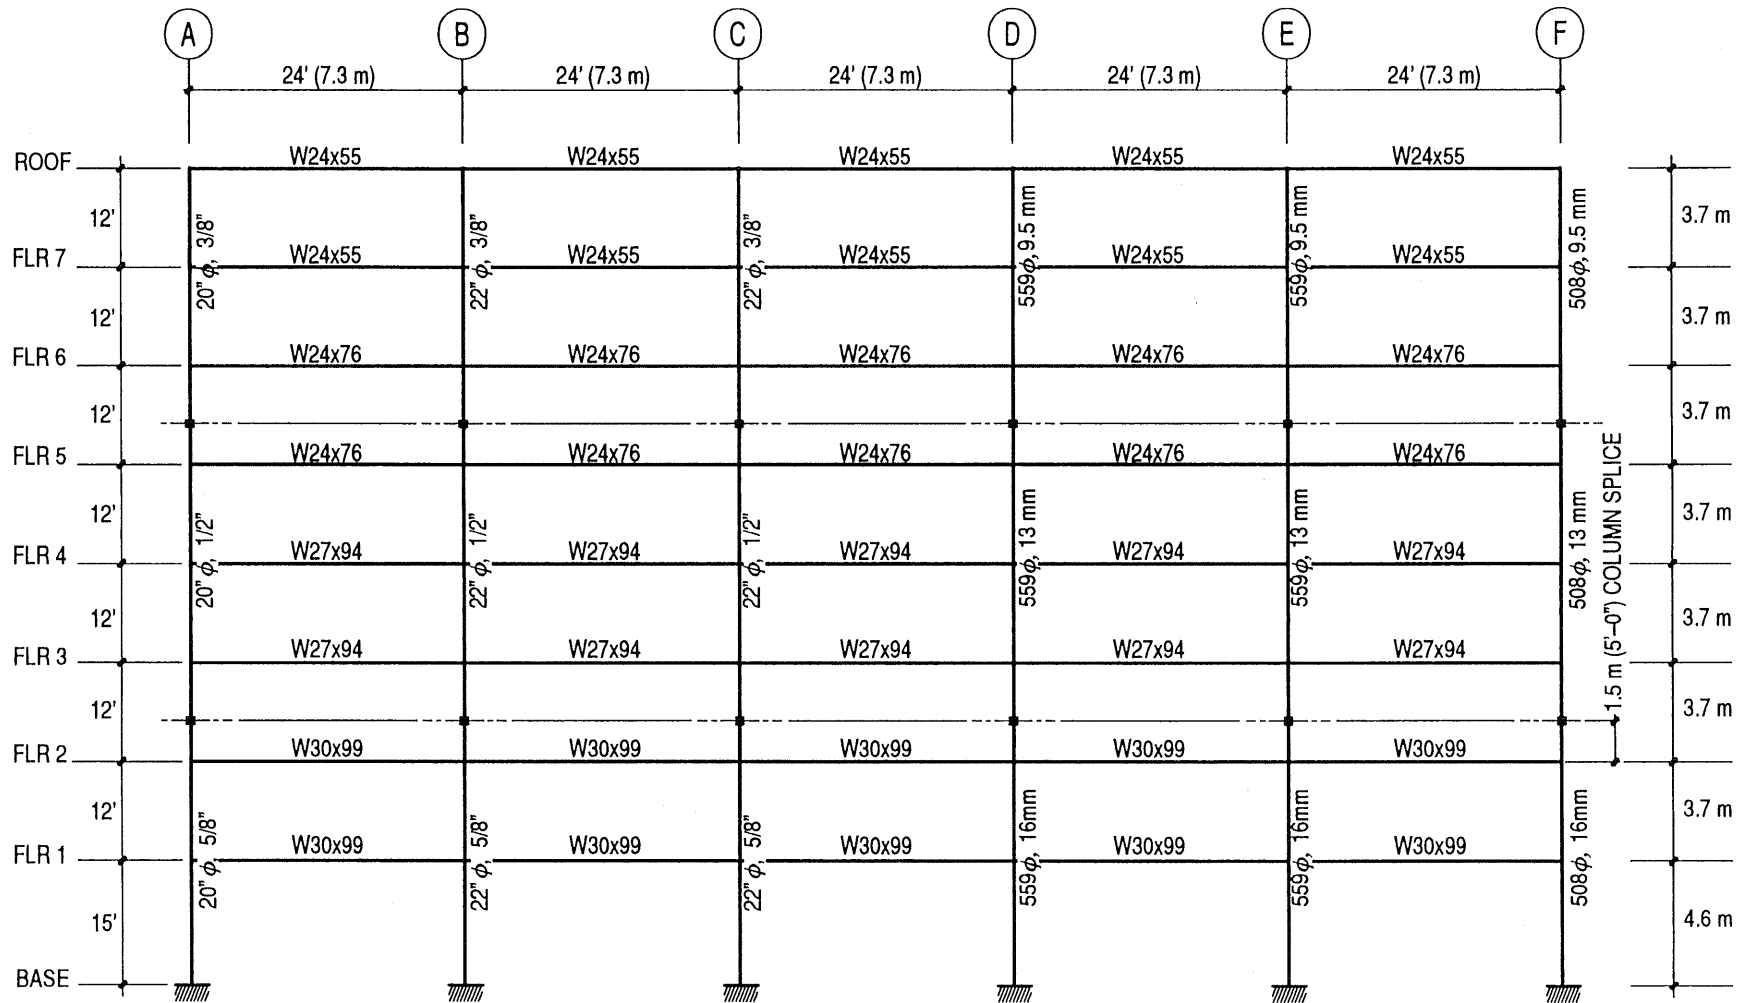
b. 8 Story Perimeter Frame, Elevation
